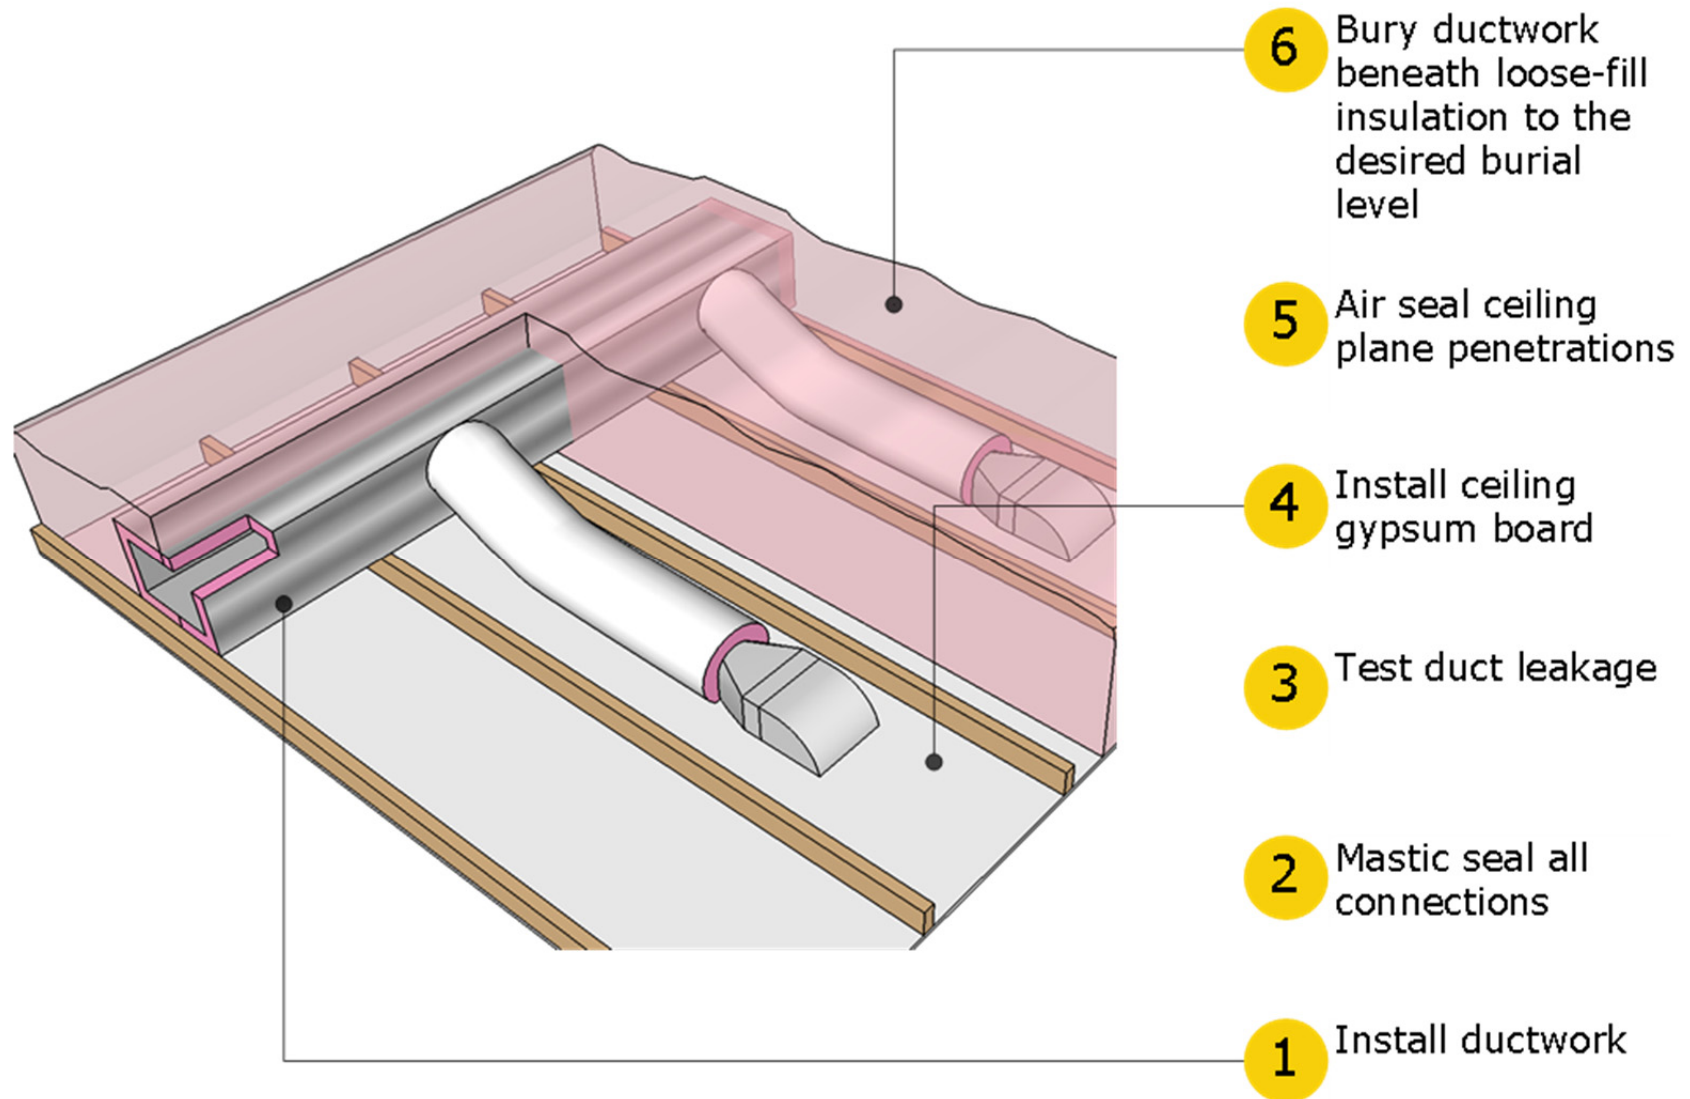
Step-by-step procedure diagram for buried ducts installed before ceiling in new construction
